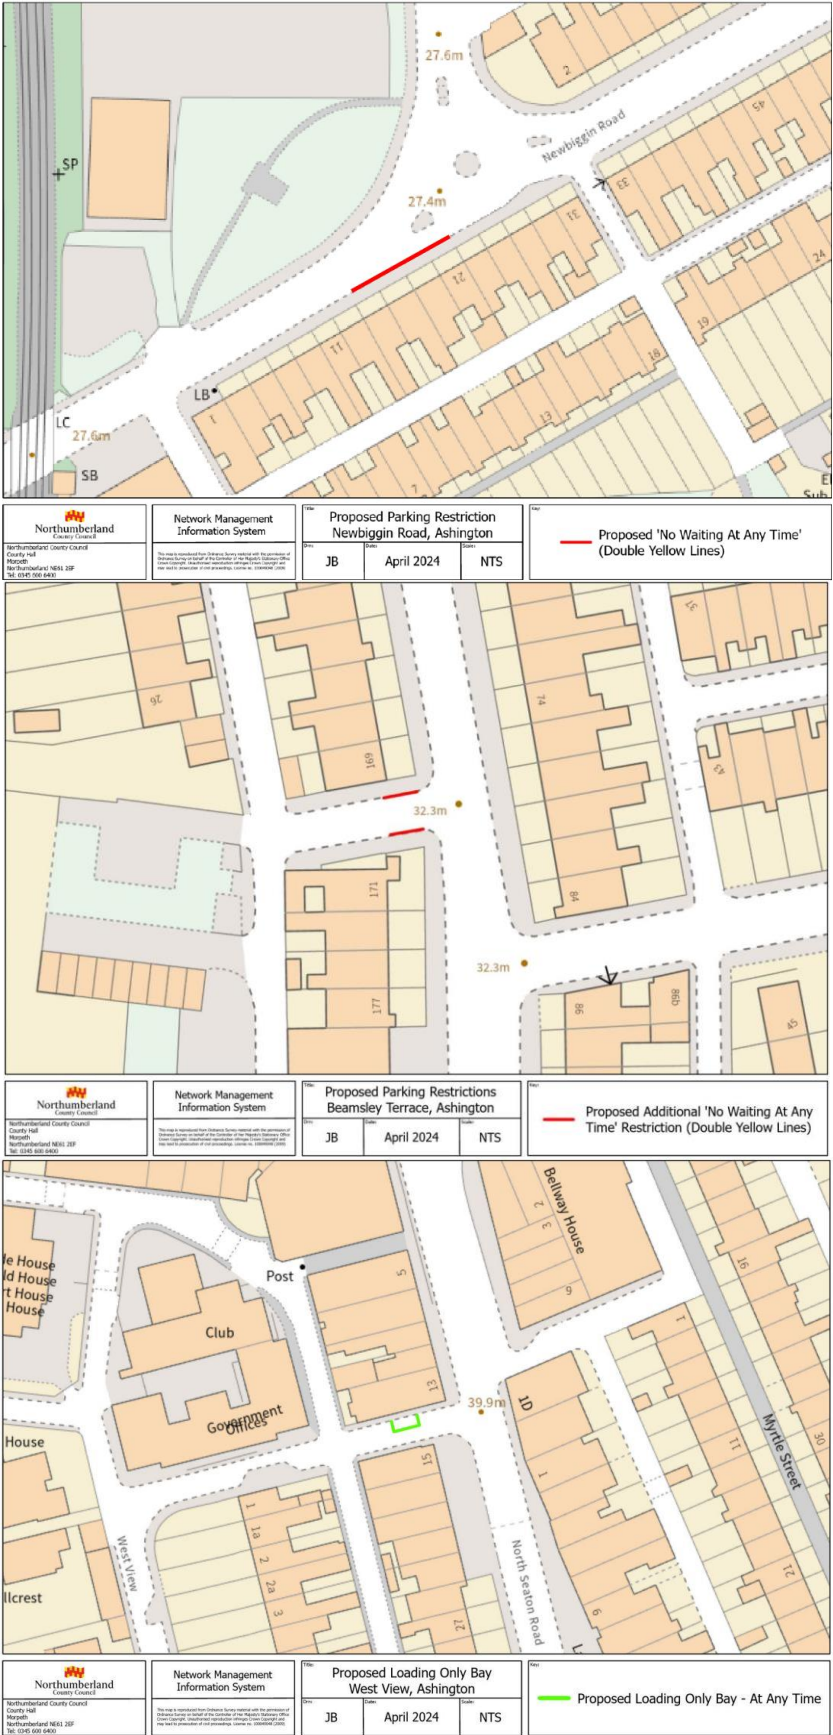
Proposed new parking restrictions as part of the A196 North Seaton Road active travel scheme
